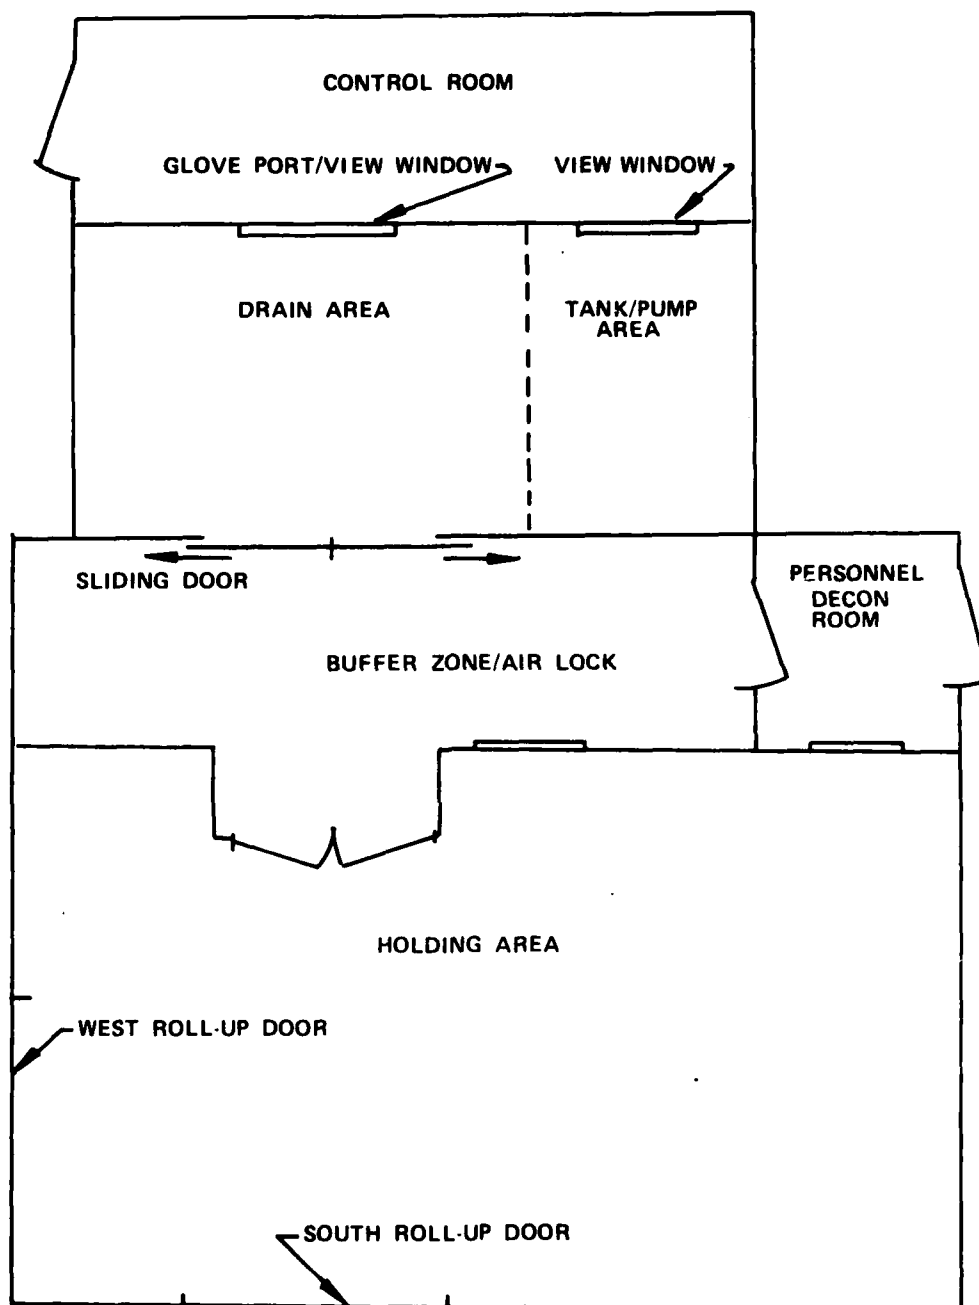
BULK ITEM FACILITY FLOOR PLAN
